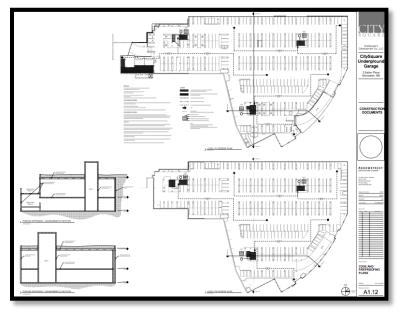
Architectural drawings by levels and elevations of the underground parking garage (Gateway)
